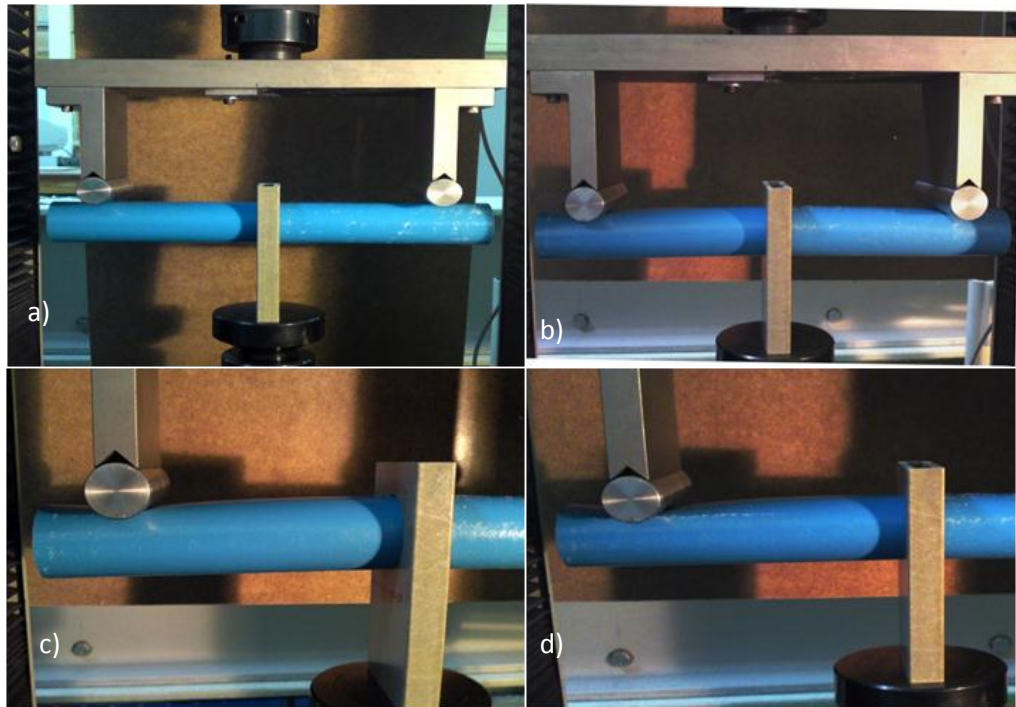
Progressive failure of tube dowel for the shear-moment load arrangement: (a) at first stage of loading (b) failure mode for tube shape; (c) close up for tube at failure and; (d) at post-failure with longitudinal cracks at mid-depth.
